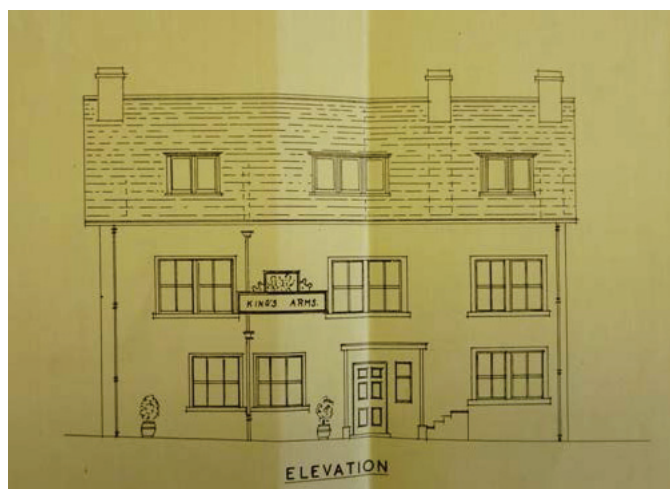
(right): Proposed front (east) elevation (CAC(B) BSRDNL/3/1681 1939)
